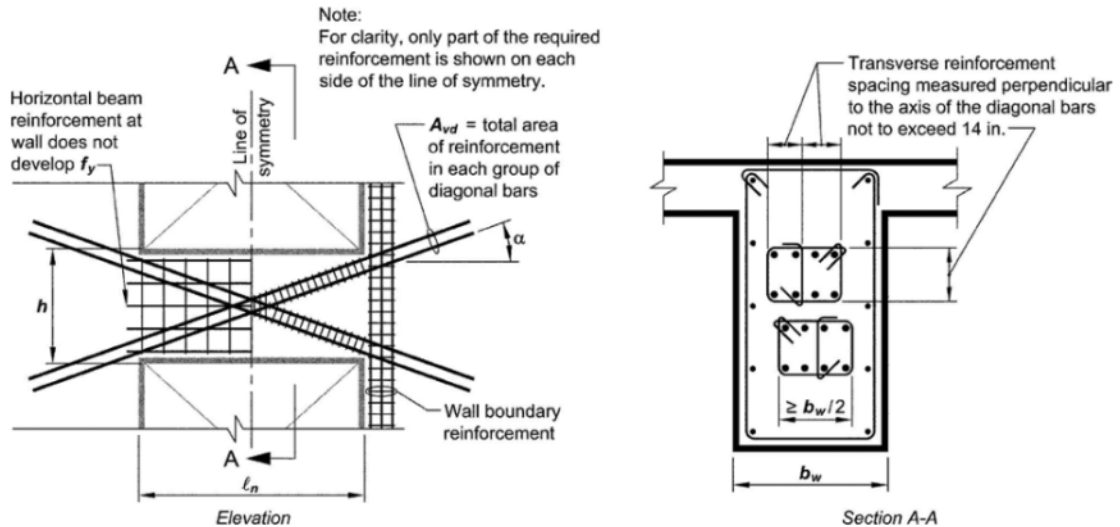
Coupling beam design with diagonally oriented reinforcement (ACI 318-11)
